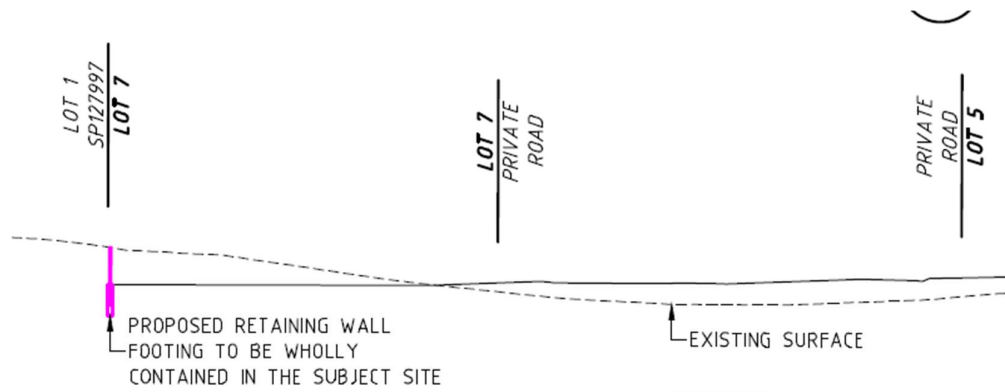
Section B of Civil Engineering plans showing cut through HES mapping
